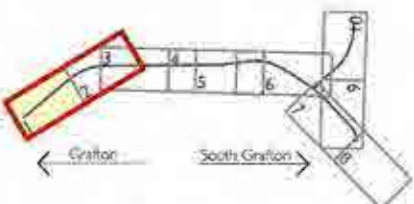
URBAN DESIGN AND LANDSCAPE CONCEPT PLAN – SHEETS 1 & 2
